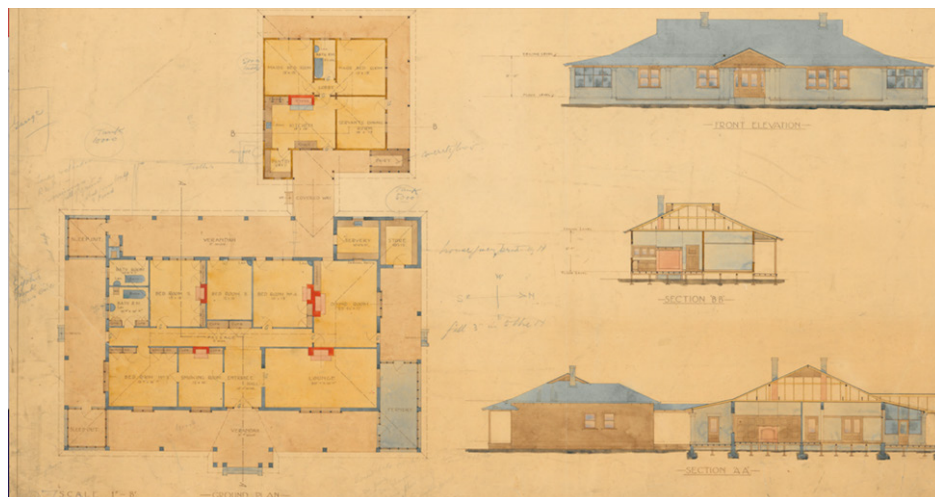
Detail of plan and design of house showing two enclosed verandah sleepouts for use by the affluent Ross family, by architect Albion Henry Walkley, 1924-30, collection of the State Library of Victoria.
